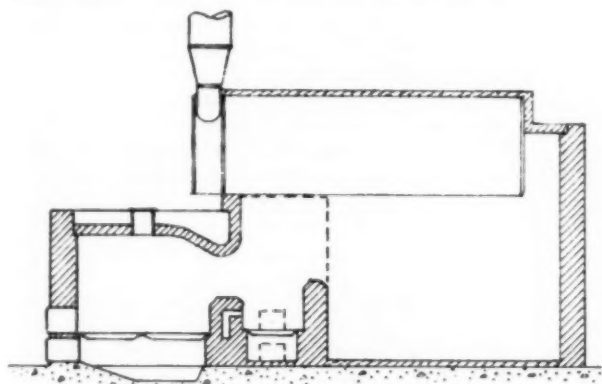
SUCCESSFUL TYPE OF SETTING FOR HORIZONTAL-RETURN TUBULAR BOILER
